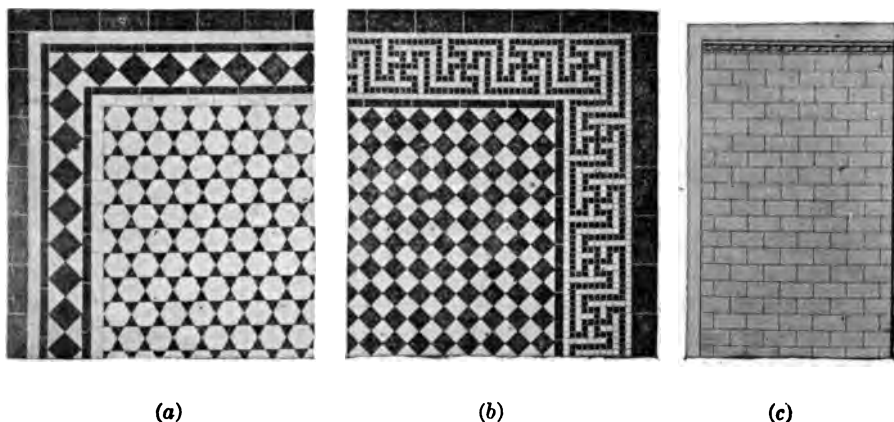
Floor Tile and Wall Tile Designs. (a) and (b) floor tile, (c) wall tile.
